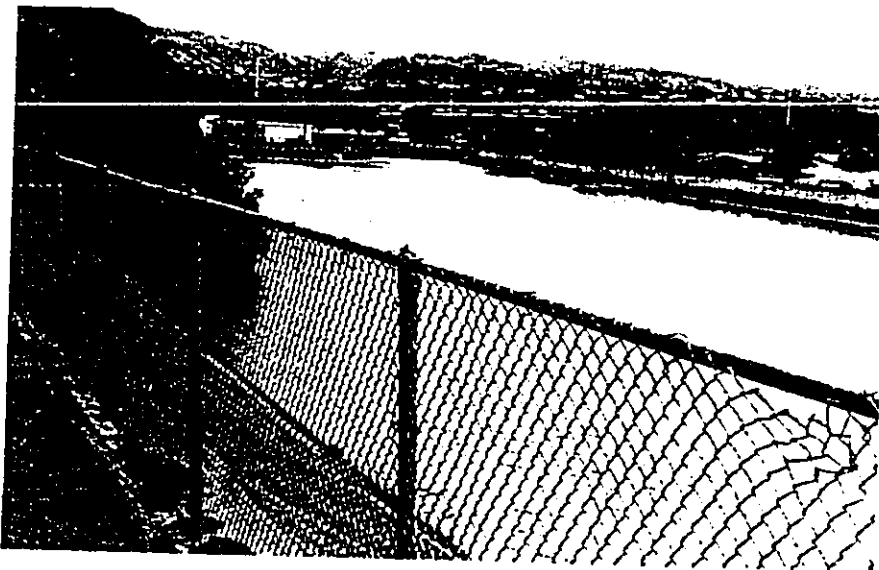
Looking north towards Moanalua Road and upper extent of project boundary. This area will be dredged.
